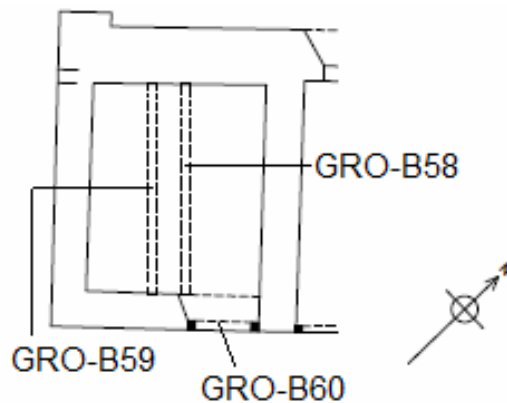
Ground-floor plan of tower I, showing the location of samples GRO-B58–60 (after Finn et al 2009)
